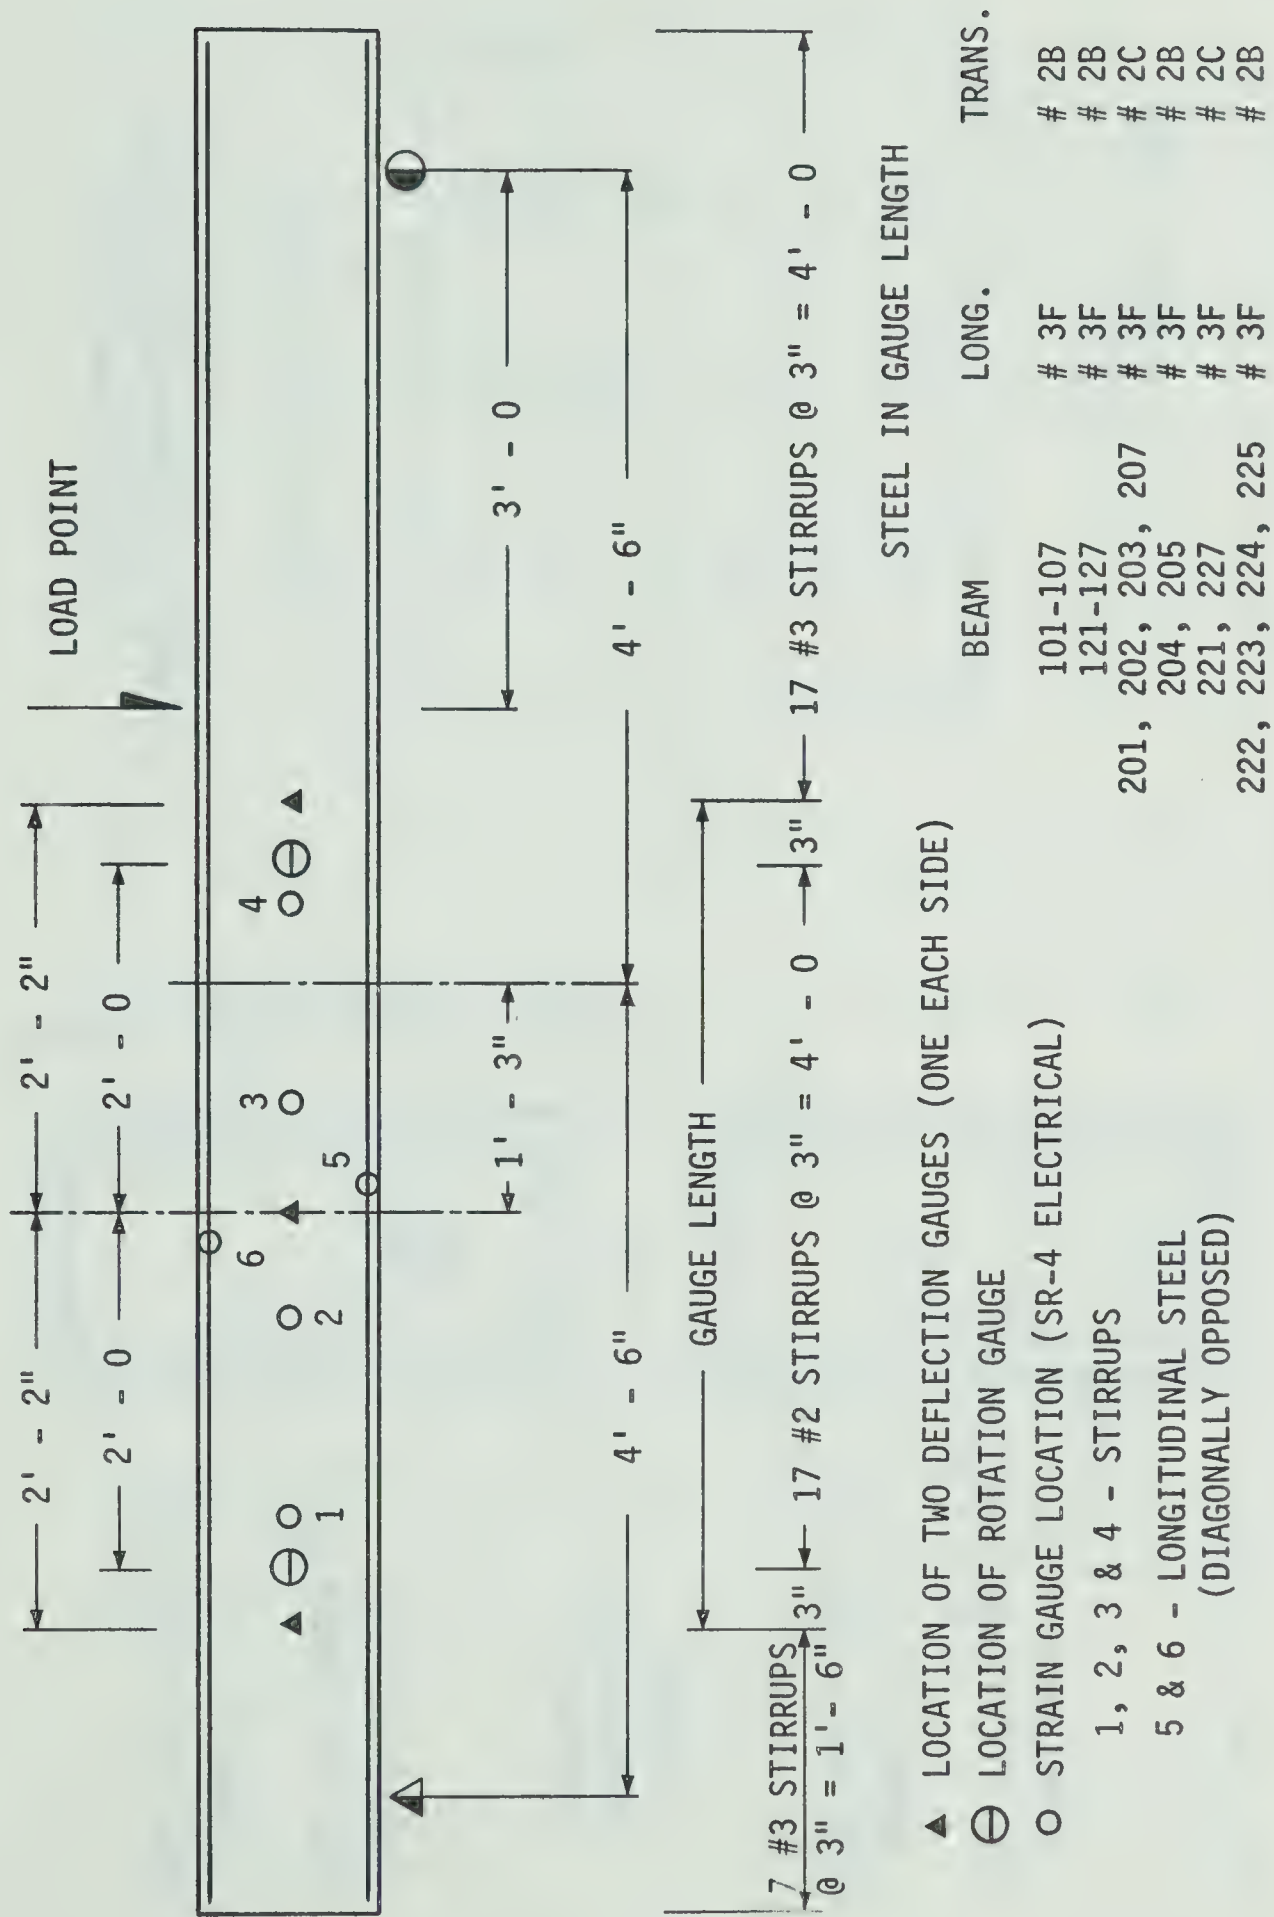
TYPICAL SPECIMEN VIEWED FROM NORTH SIDE
